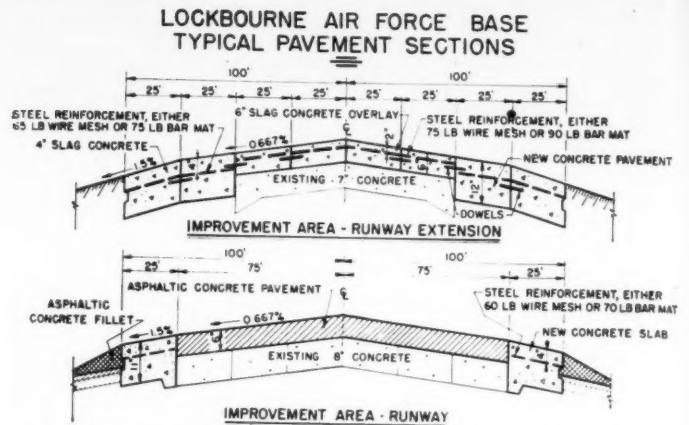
Paving sections through the resurfacing and widening of the existing Northeast-Southwest runway.
